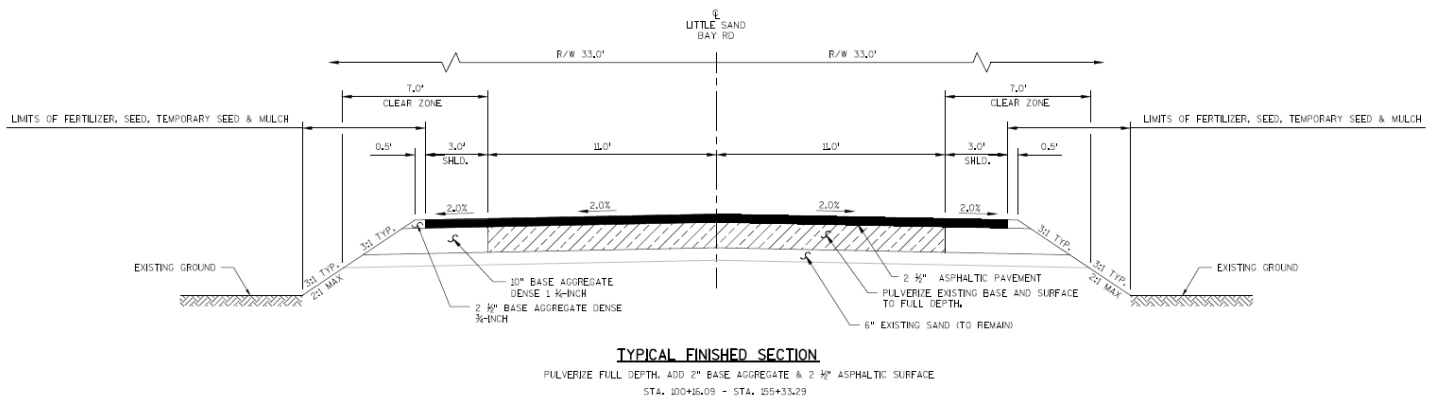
Typical Finished Section Sta. 100+16.08 - Sta. 155+33.29
